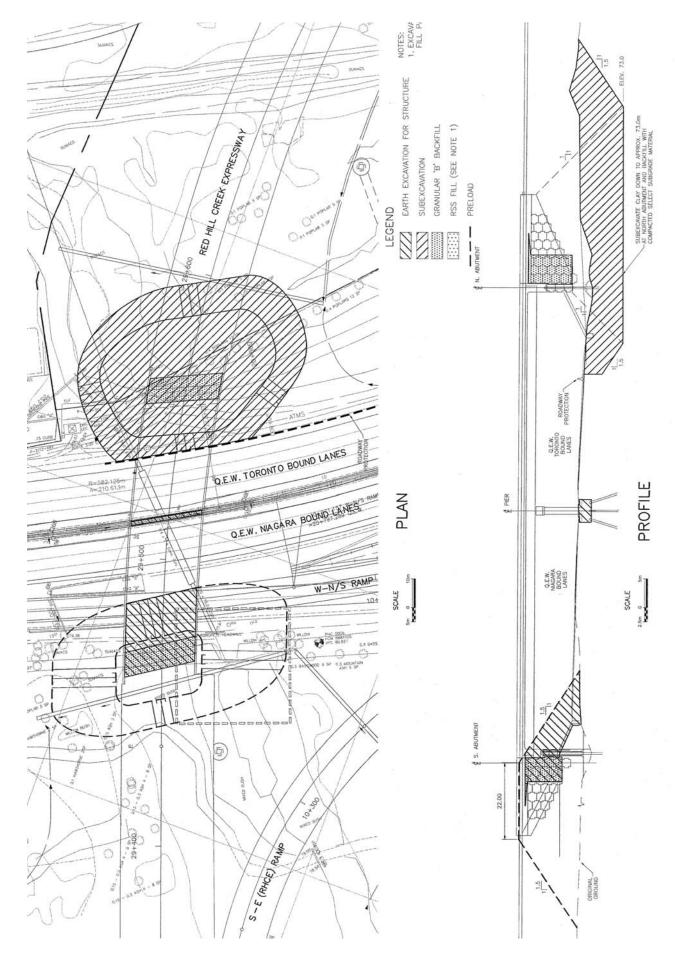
Sample Drawing Showing Earth Excavation at Structure.
